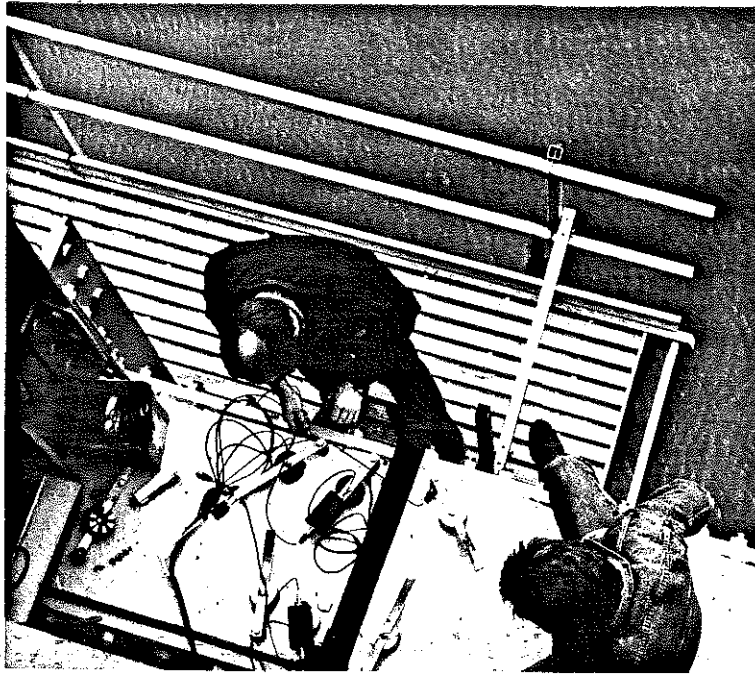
Placement of Six-Sensor Array to Monitor a Butt Weld on a Tie-Chord Upper Flange of the I-24 Bridge at Paducah.
